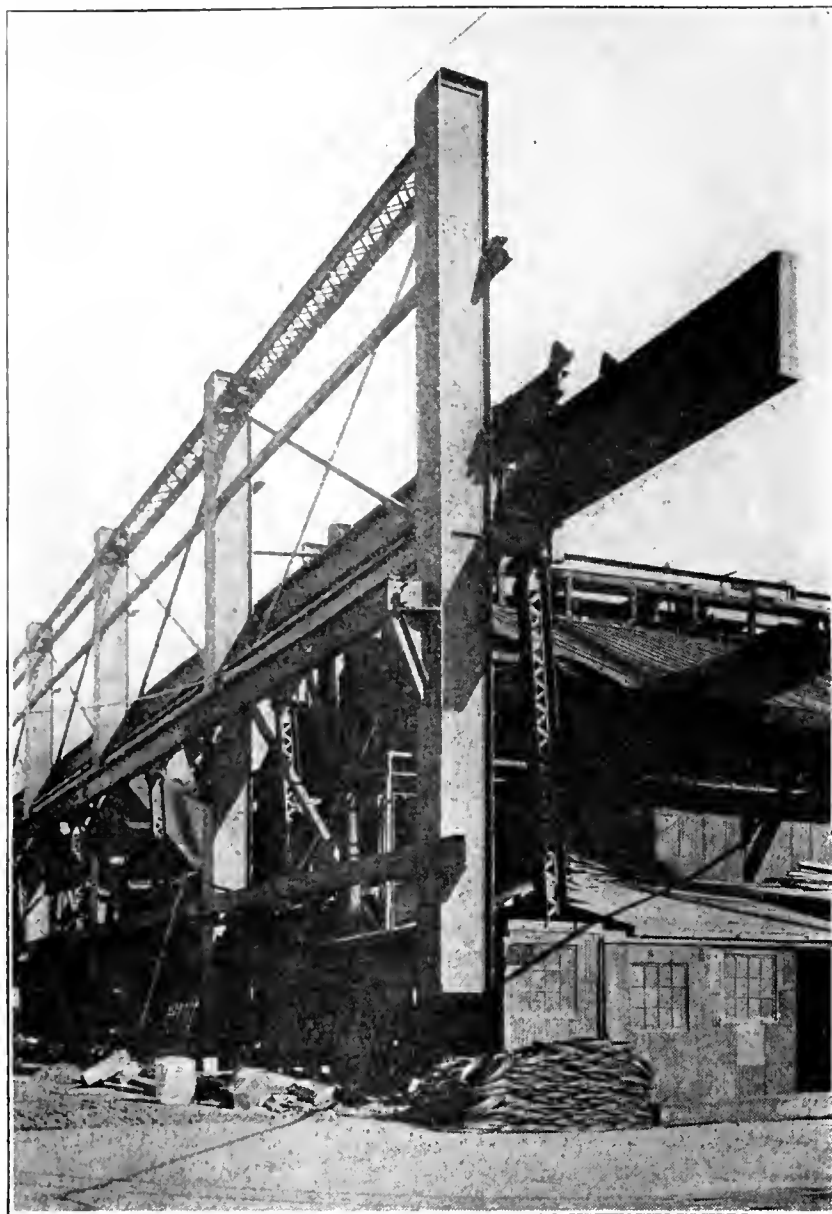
SIDE COLUMNS AND CRANE GIRDERS FORMING TRACK FOR ROLLING TRUSSES
